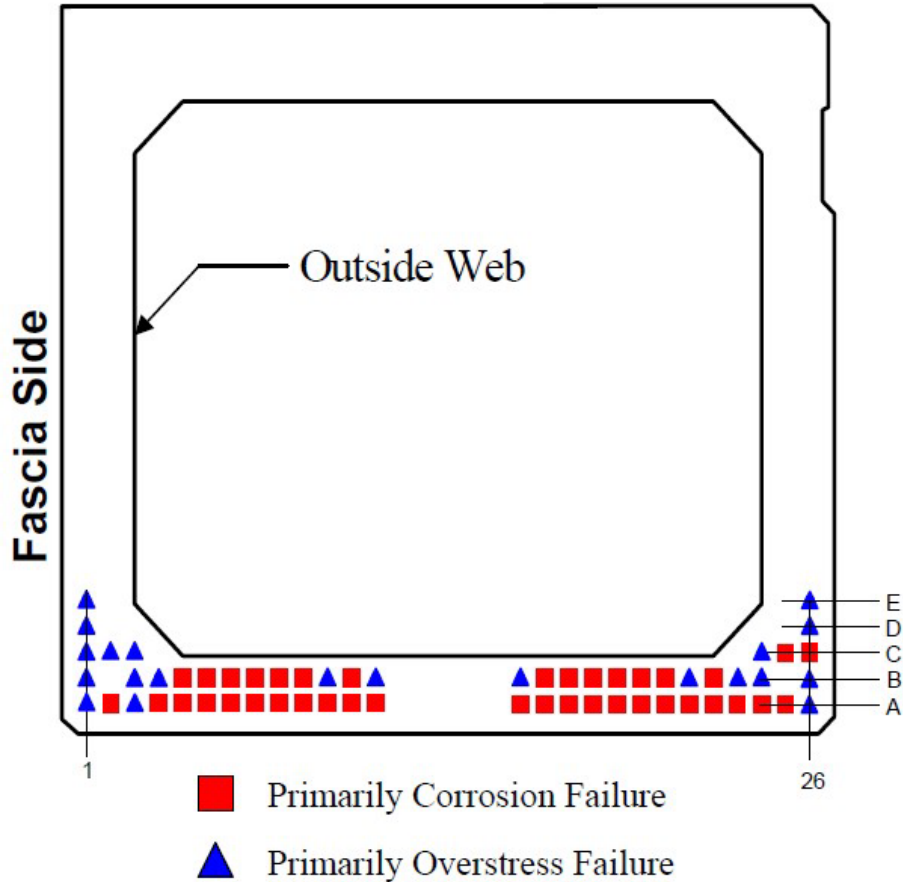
Beam 1 Post-Collapse Prestressing Strand Wire Fracture Assessment
